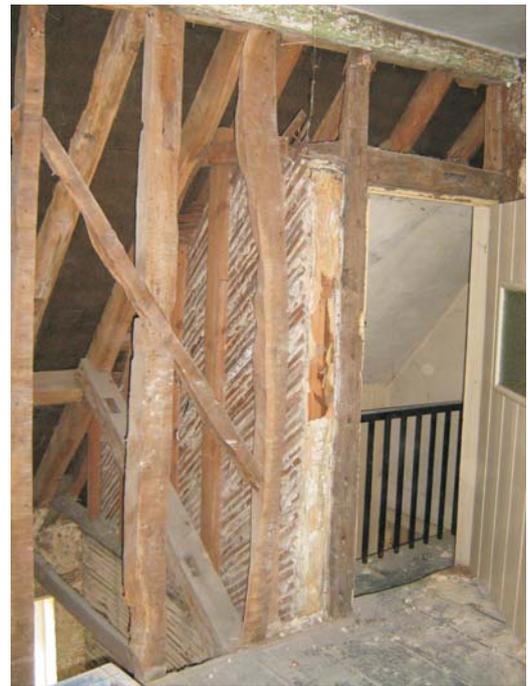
The south wall of bedroom 2 with raking strut to purlin of the outshot roof construction
